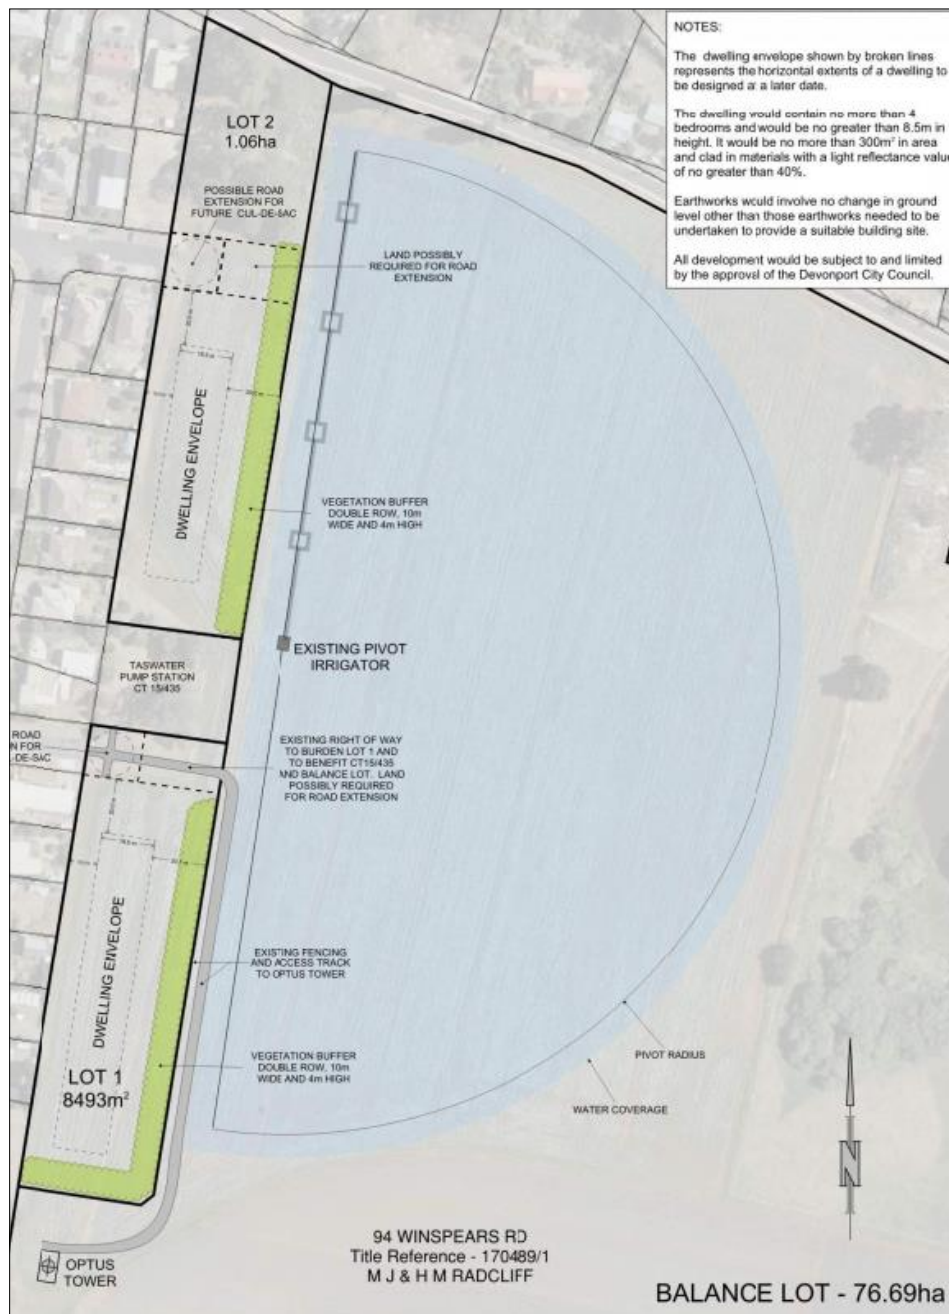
Subdivision plan (PDA Surveyors, 2020)
